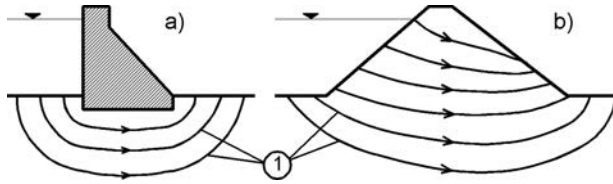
Seepage beneath a concrete dam (a), and through the body and foundation of an earth dam (b); (1) seepage.
